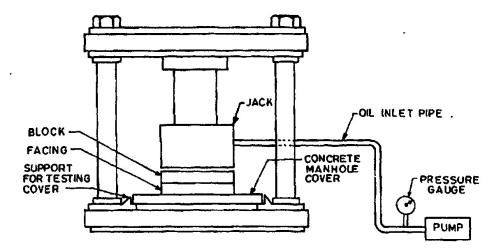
ARRANGEMENT FOR LOAD TEST OF MANHOLE COVER
